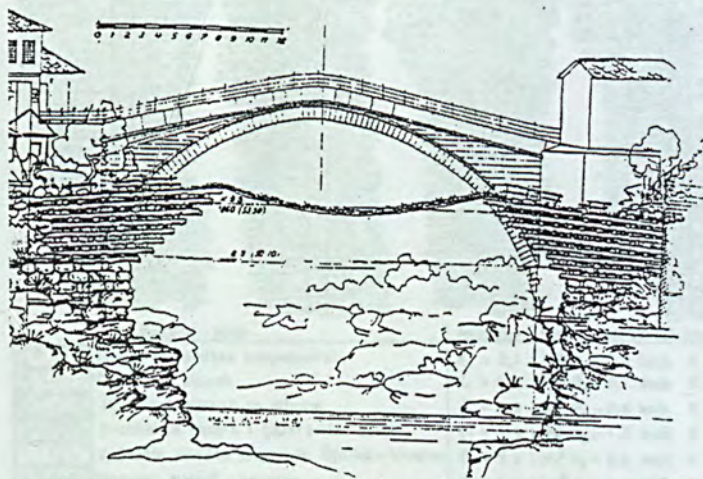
One hypothesis of outlook and construction of foundation with complex construction of wood and stone of suspension bridge before building of the Old Bridge
